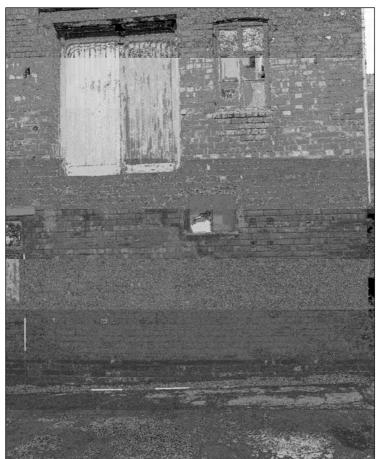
Detail of widened first floor door, removed external staircase scar and inserted window, south elevation of north range (film 20.7)
